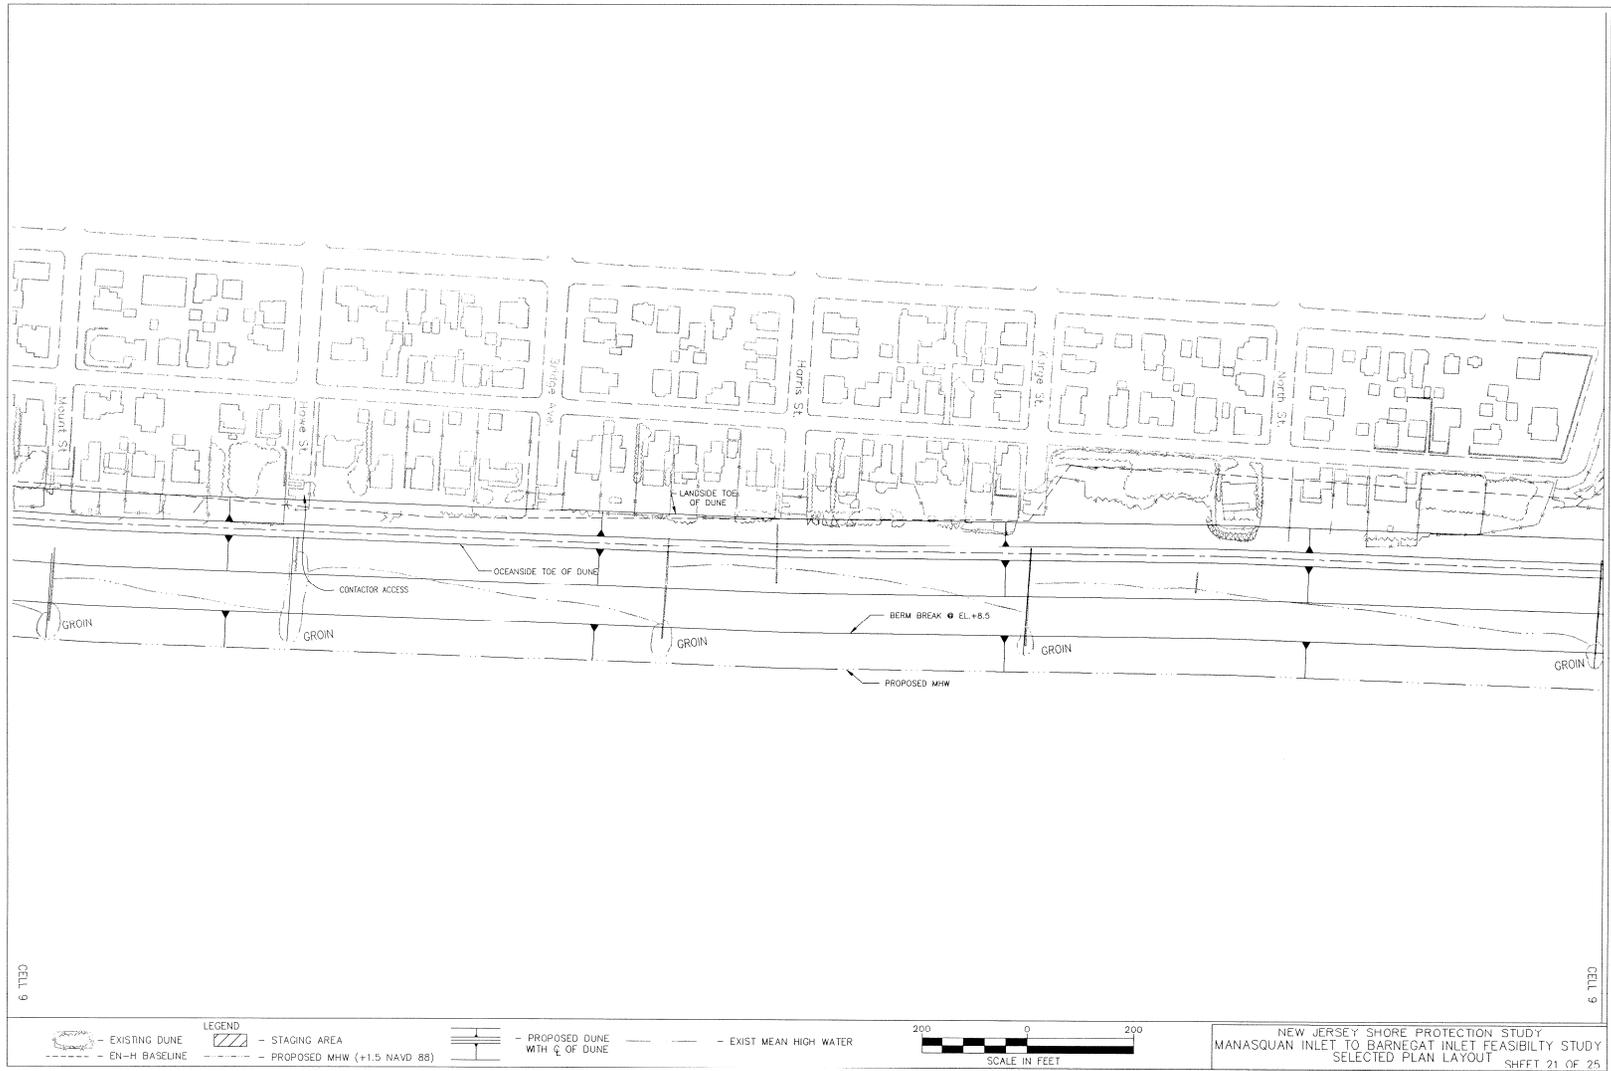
Selected Plan Layout – Bay Head Borough, Mount Street to North Street
